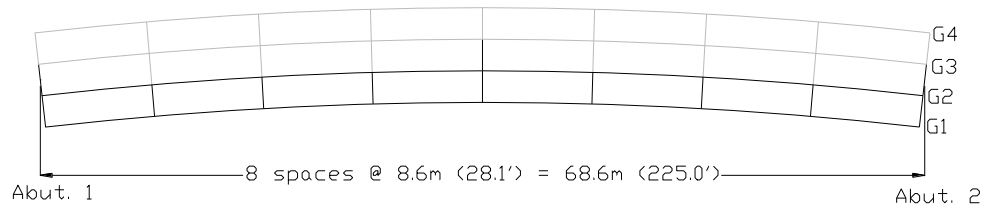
Stage 2 of Construction for Single Girder (Inner Girder Placed First) Erection of Single-Span, 4-Girder, 305-m (1000-ft) Radius Bridge.
